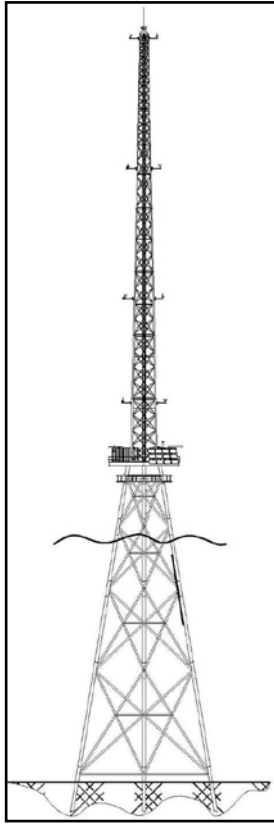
Lattice-type Mast-mounted Meteorological Tower on a Steel Jacket Foundation
